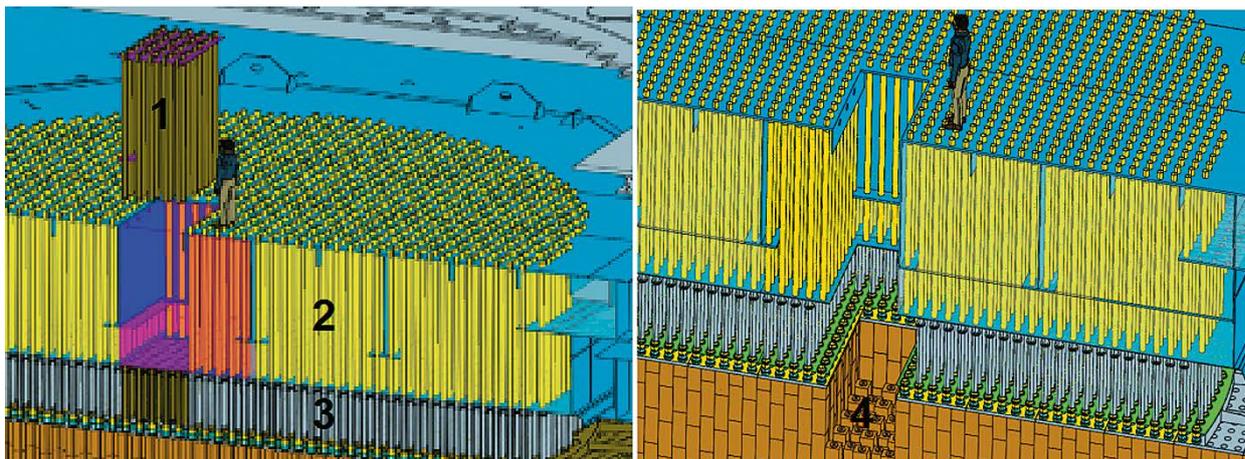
Schematic diagram showing the arrangement of an opening providing access to the graphite stack: 1 – the extracted fragment of layout E; 2 – layout E; 3 – the area between the bottom slab in layout E and the graphite stack; 4 – stack section with removed graphite blocks
